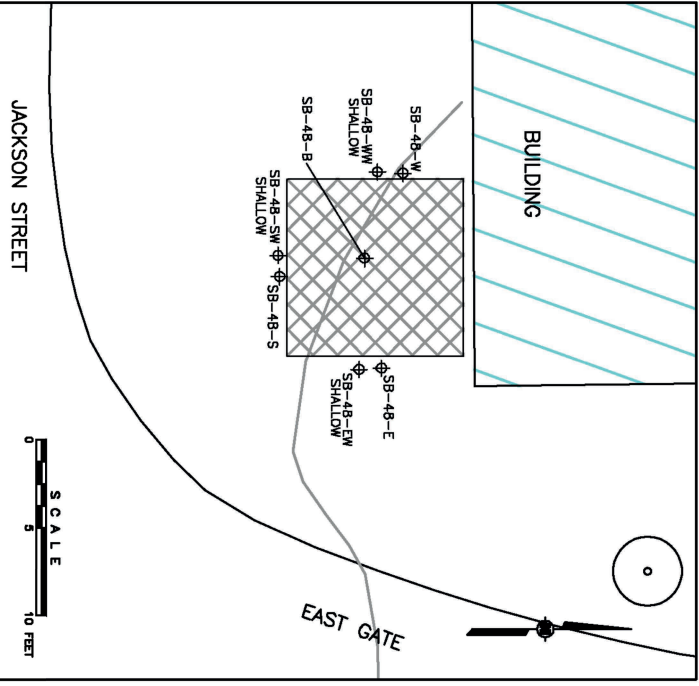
DETAIL D: NORTHEAST OF FORMER LEACH PLANT EXCAVATION (CSB-22)
